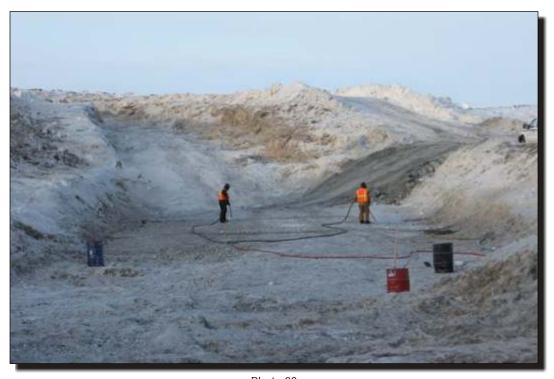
Southeast Dam Labour crew cleaning trench with compressed air.
